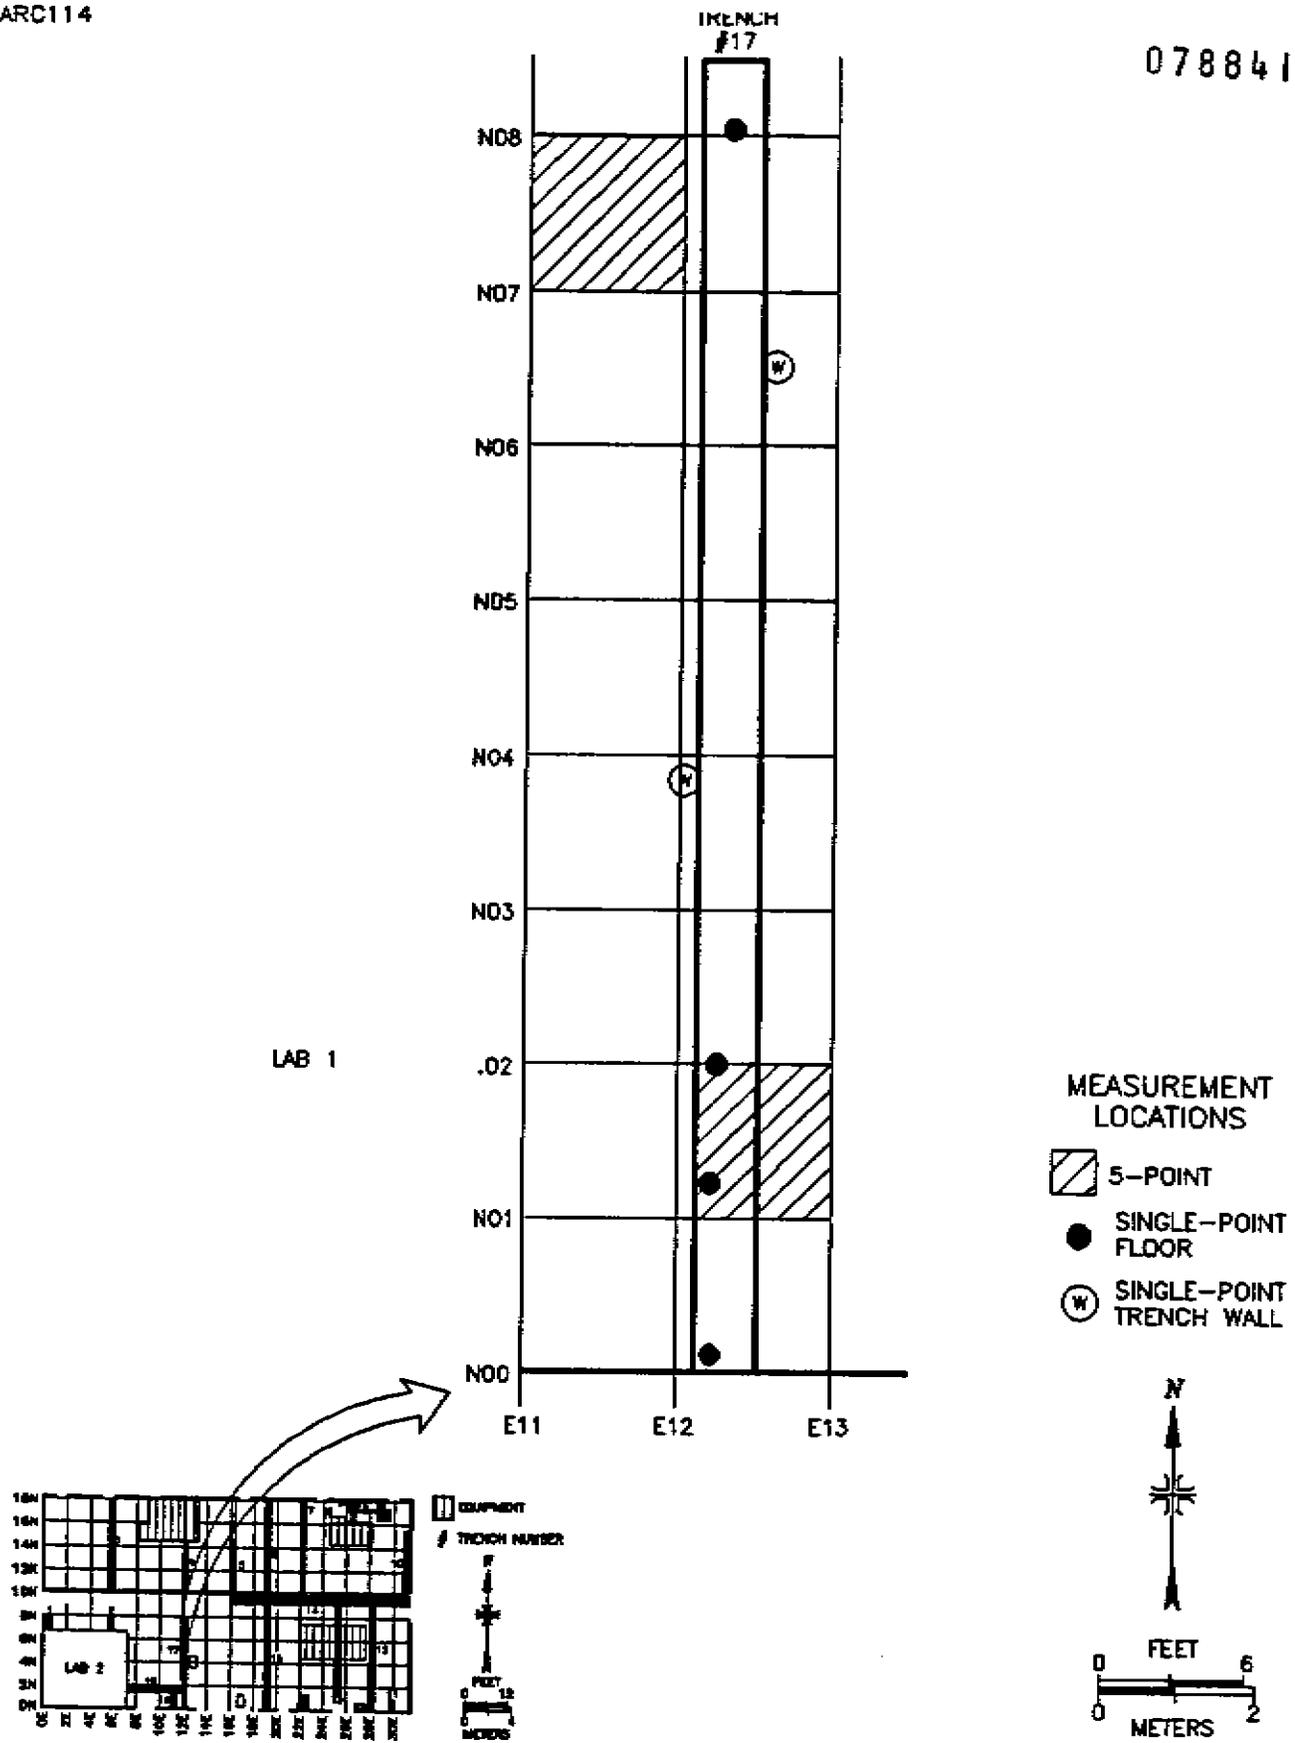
Building 23, Lab 1, Trench 17, Indicating Measurement Locations
